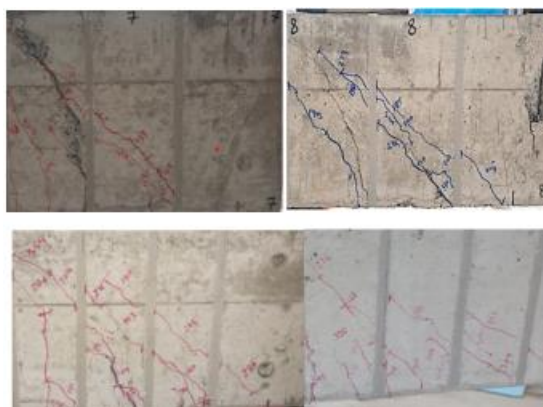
Crack Pattern For Both FRP and Stirrup Reinforced (Ibrahim, Wakjira and Ebead, 2020)
